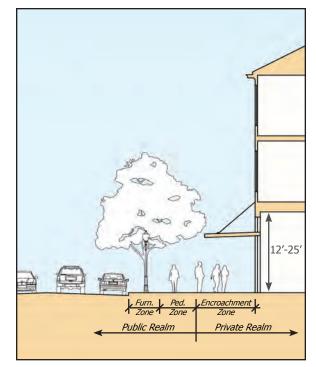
Cross Section, Shopfront Frontage (Illustrative)
